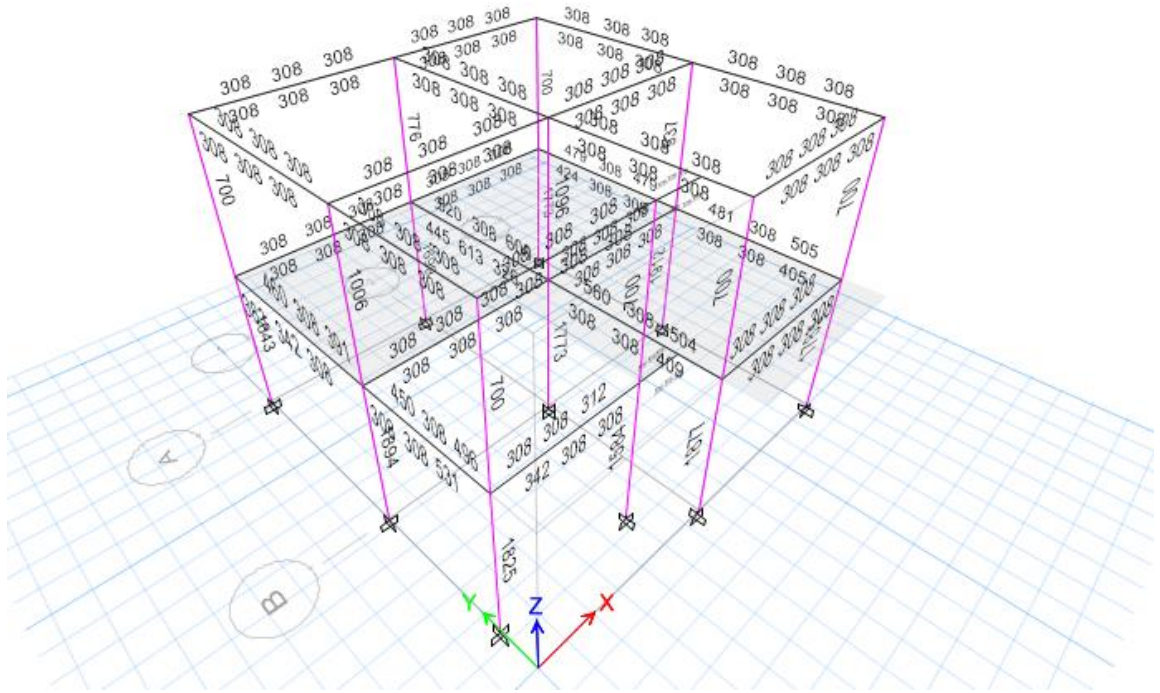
3-D view longitudinal reinforcing frame section (Euro code 2-2004) (mm²)
